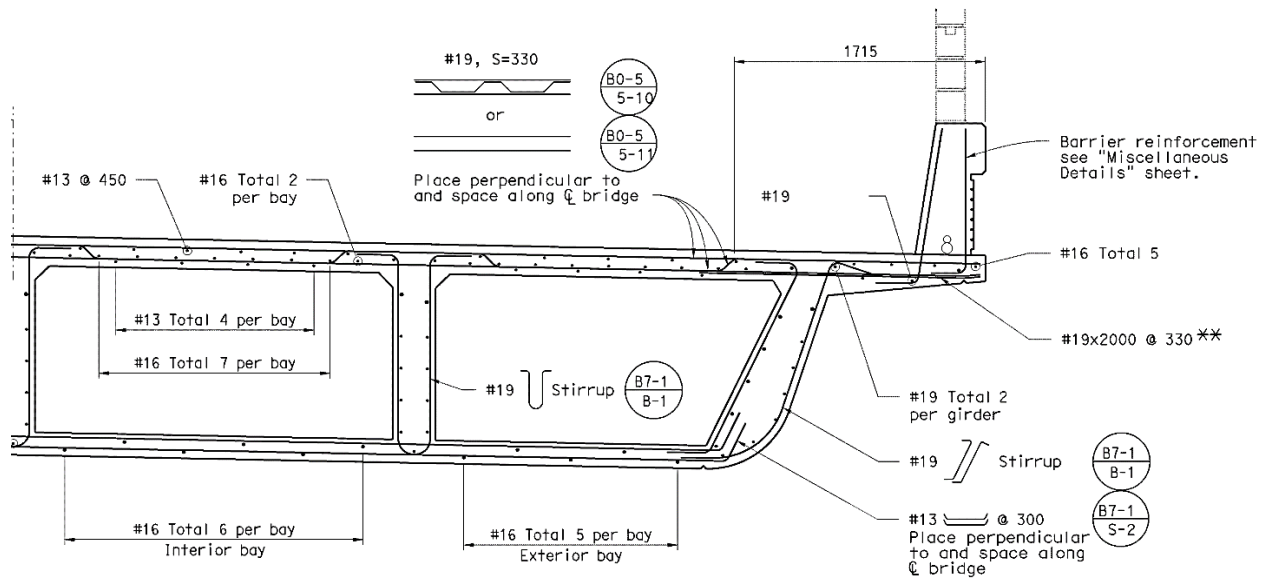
Typical Cross Section (Caltrans, 2021)
